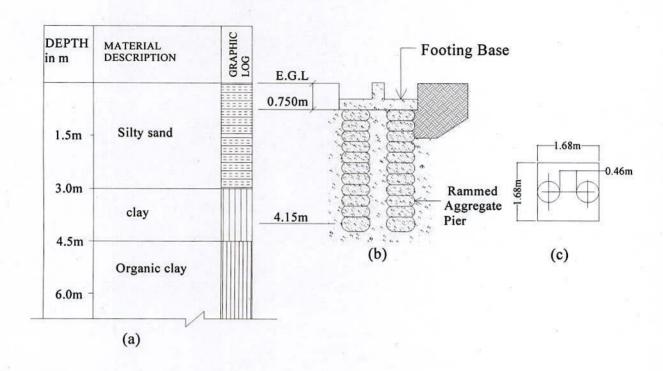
Footing placed on double RAP treated ground: (a) Sub-soil profile, (b) Section of installed double RAP under footing and (c) Plan of double RAP.
